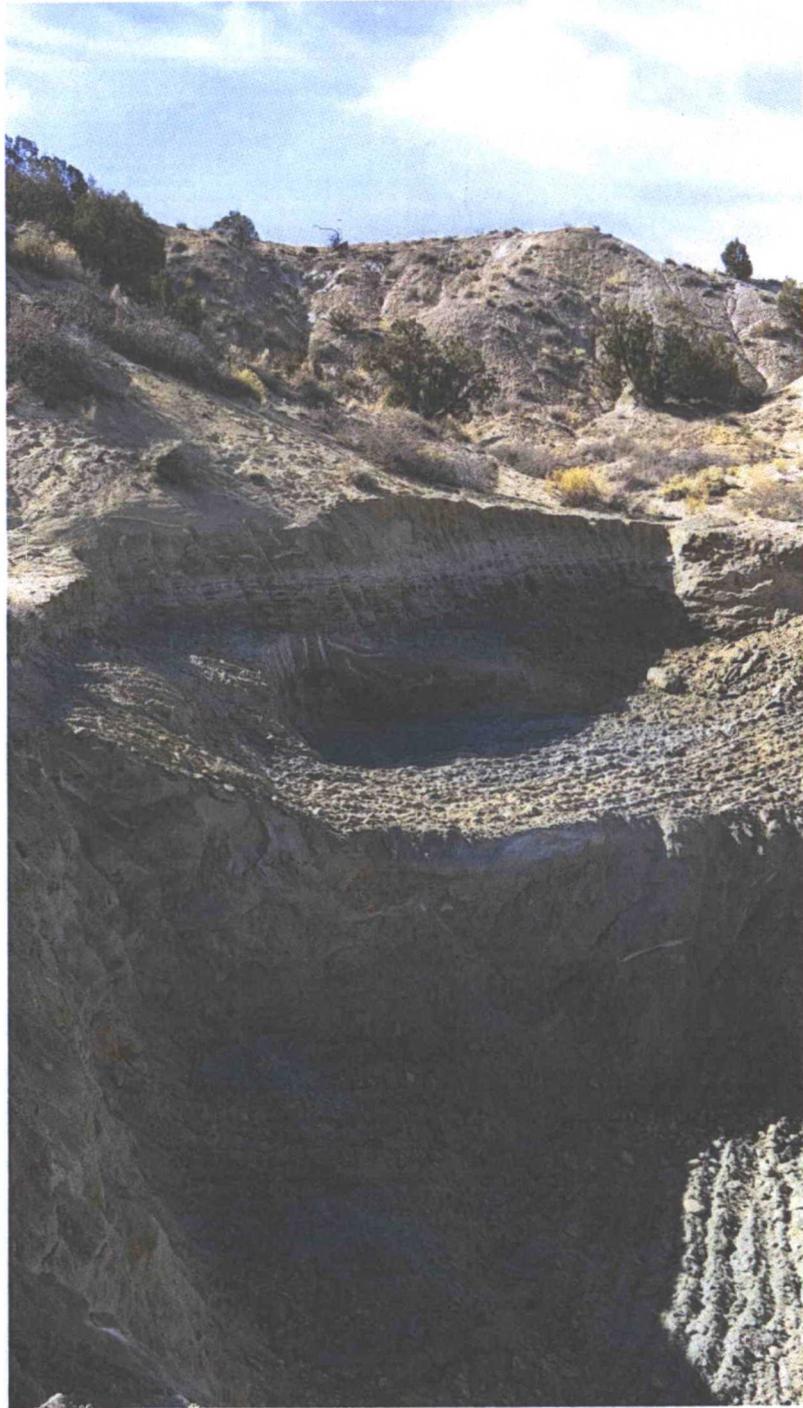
Krause WN Federal 2 Steep Western Edge of Excavation.
